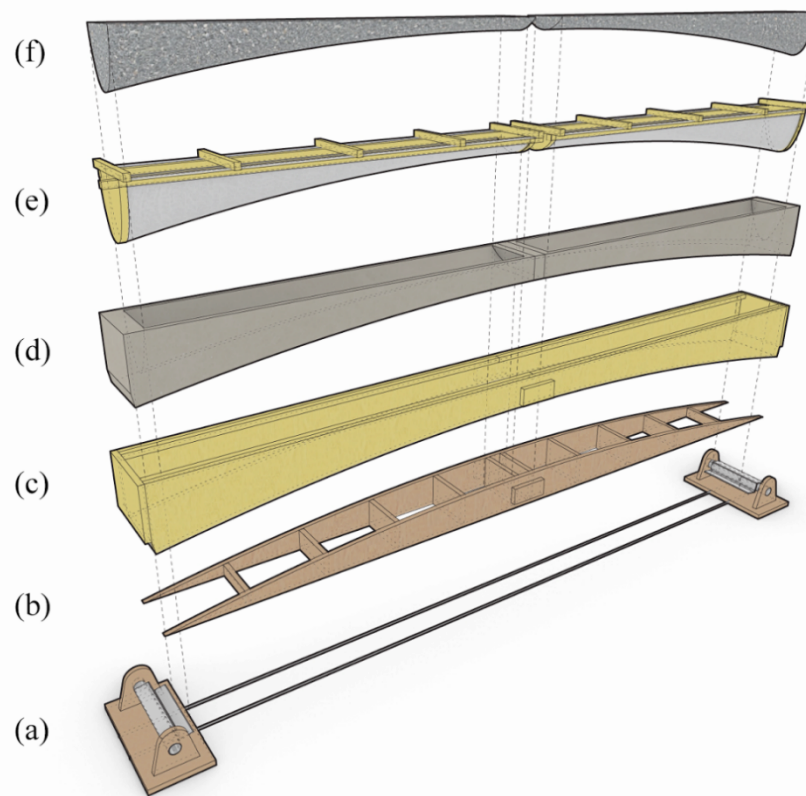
Exploded view of the fabrication with the layers as follows: (a) Pin supports connected with tension ties, (b) Scaffolding, (c) wooden formwork, (d) casted arched beam, (e) fabric formwork stiffened with timber elements for the floor voids and rib formations, and (f) locally sourced soil or gravel fill. (The lateral boards of the formwork are removed after two days to enhance the drying process and avoid cracking due to friction.)
